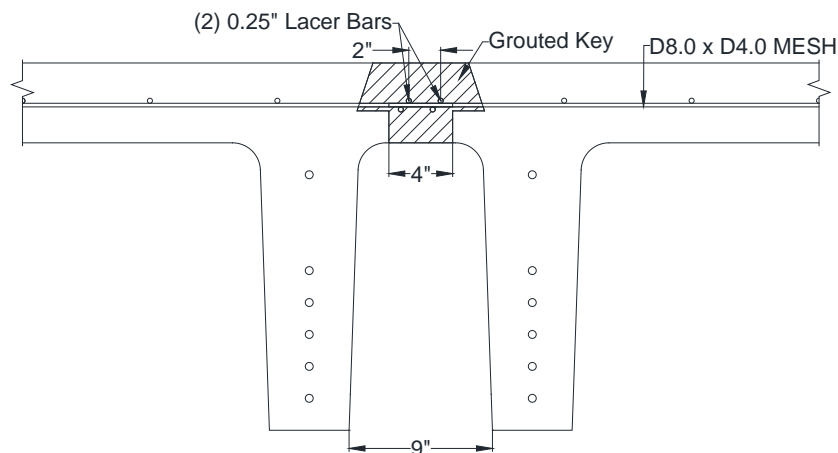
Continuous Joint Detailing for Double-Tee Bridges (Konrad, 2014)
